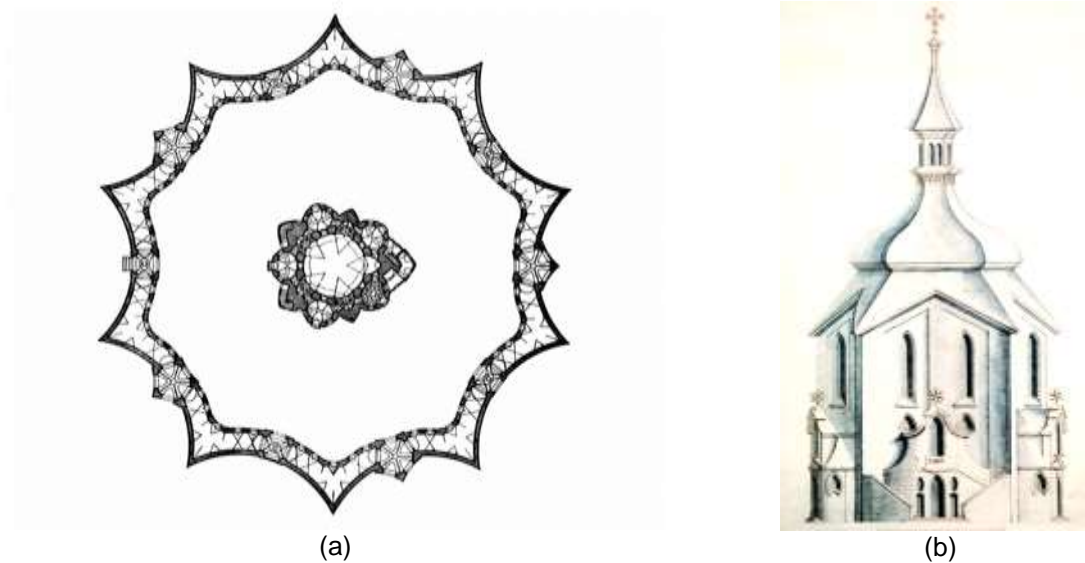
(a) Plan of the church and its ambit with chapels; (b) Elevation of the main church. (Church of St. John of Nepomuk, 2016)
